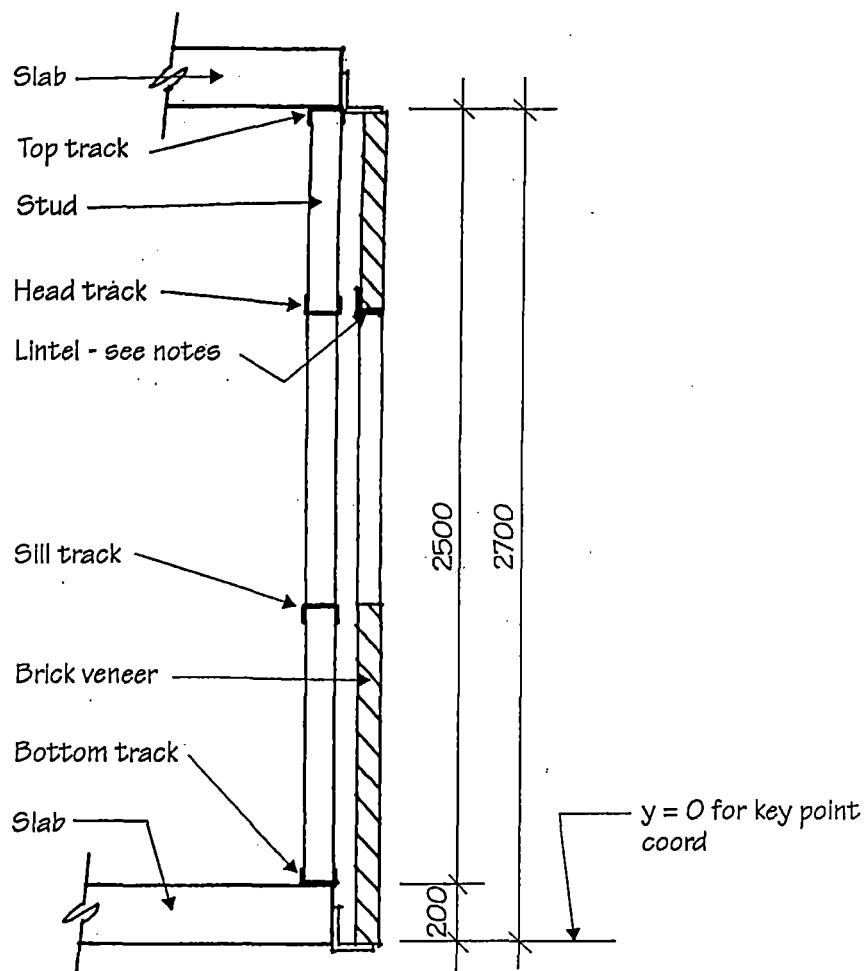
Section views of MVSS wall used for case study 2-A.
